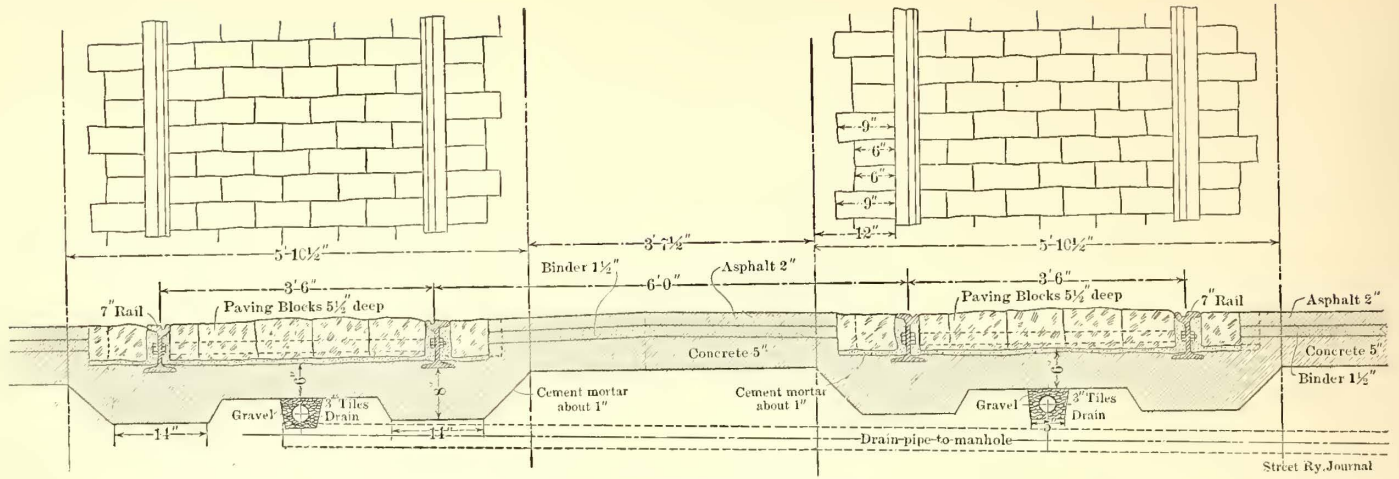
STANDARD PAVED STREET TRACK CONSTRUCTION
